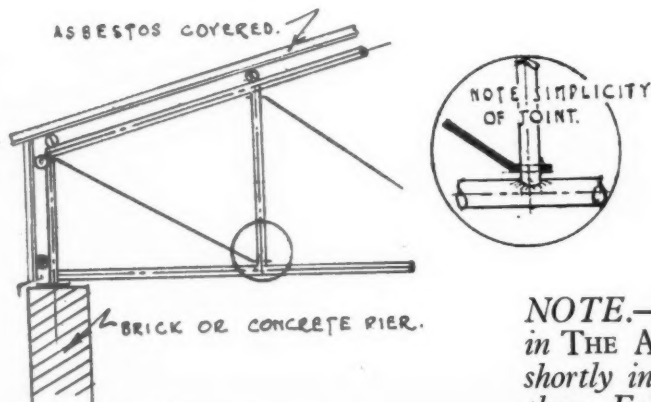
Girder type roof principle as applied to brick or concrete construction
